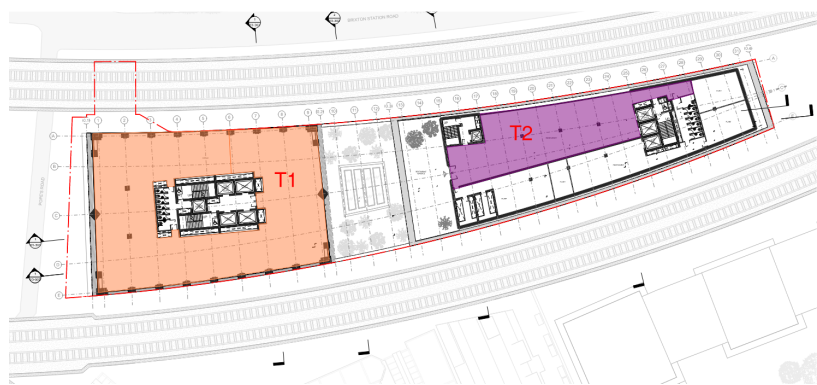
Metering boundary for Office and restaurant on Eighth Floor
